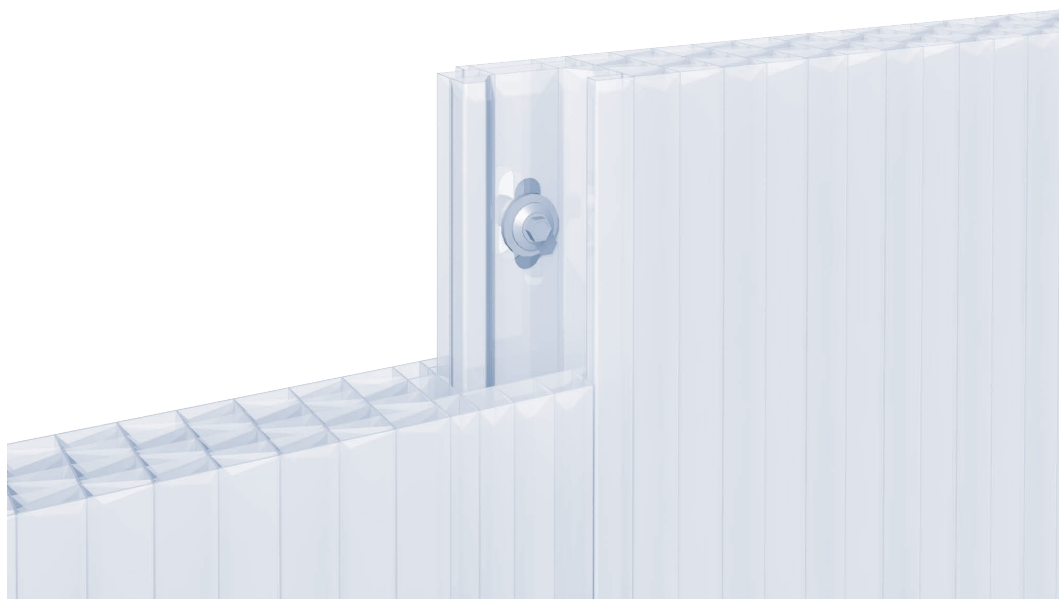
DETAIL PRESENTATION POLYCARBONATE - FAÇADE PANEL - HIDDEN FASTENING
